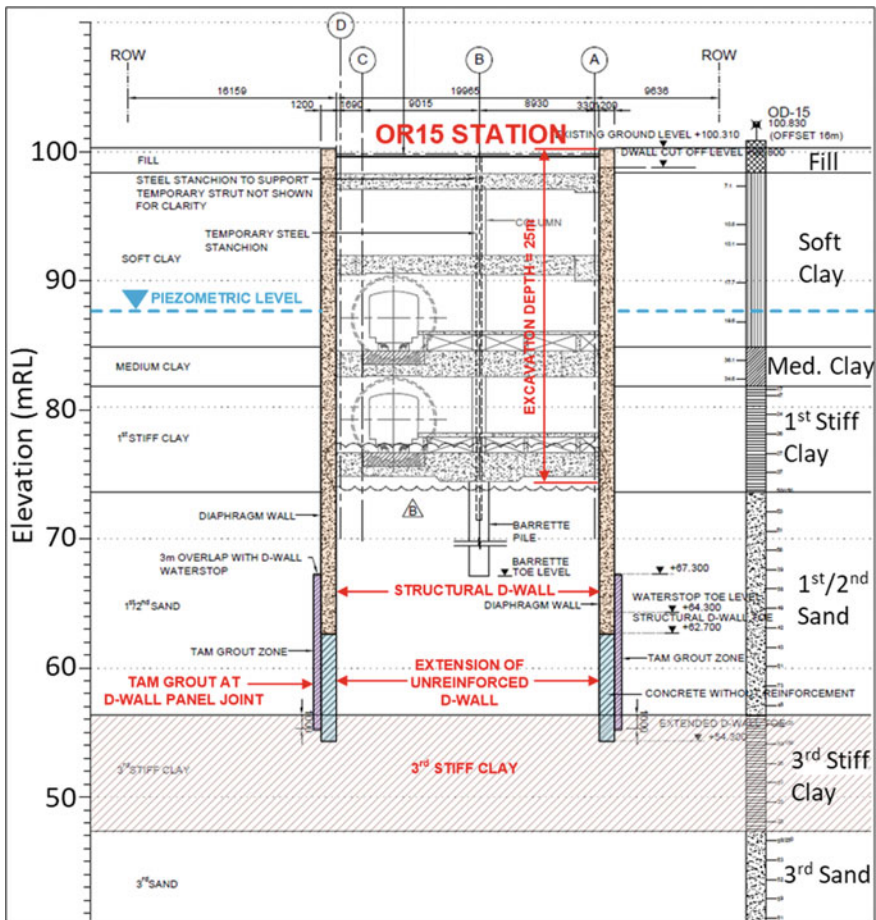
Station OR15 cross-section with extension of D-wall for groundwater cut-off
